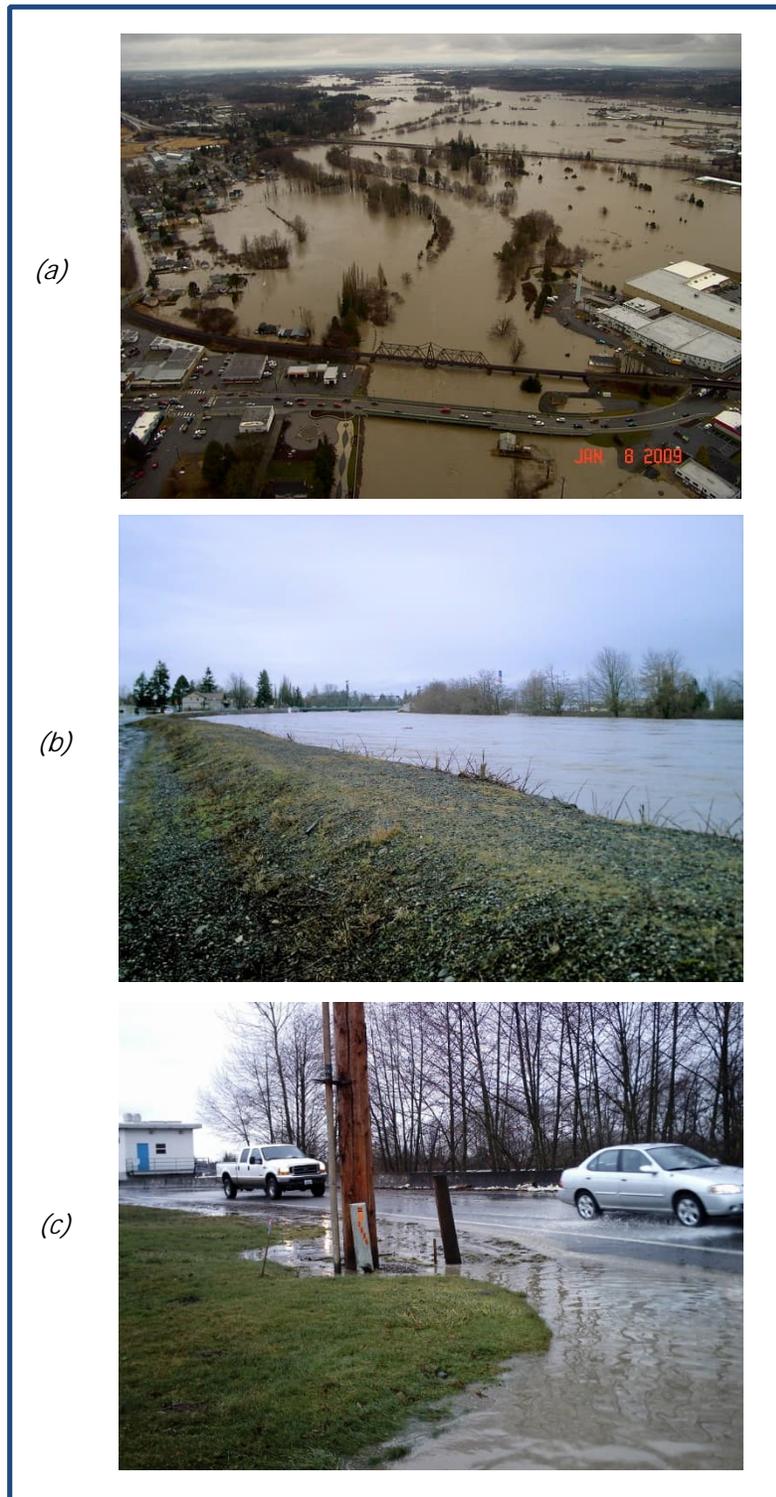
Photos from the January 2009 Flood; (a) aerial image of the Main Street bridge (foreground) facing north towards Interstate-5 (background); (b) Ferndale Levee across from Star Park facing northeast; (c) Flooding on Ferndale Road south of PUD No. 1 intake structure, facing northeast
